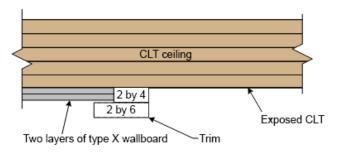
Trim added to exposed cross-laminated timber ceiling to protect edge of gypsum wallboard.
